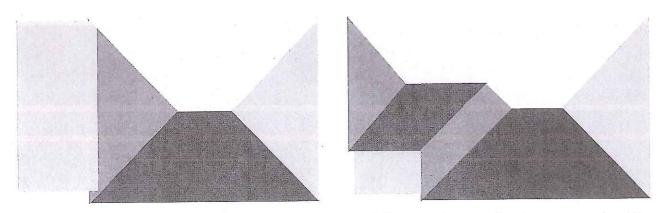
Roof plans amended to reflect Condition I (i), either as a skillion over the garage/laundry, or a secondary hip.
